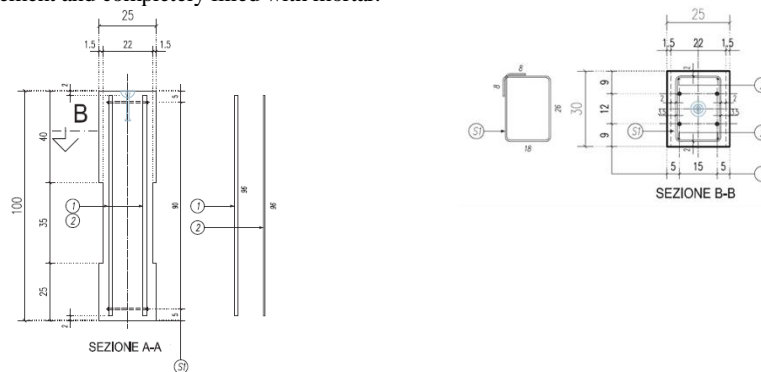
Geometry and reinforcement layout of solid benchmark.
